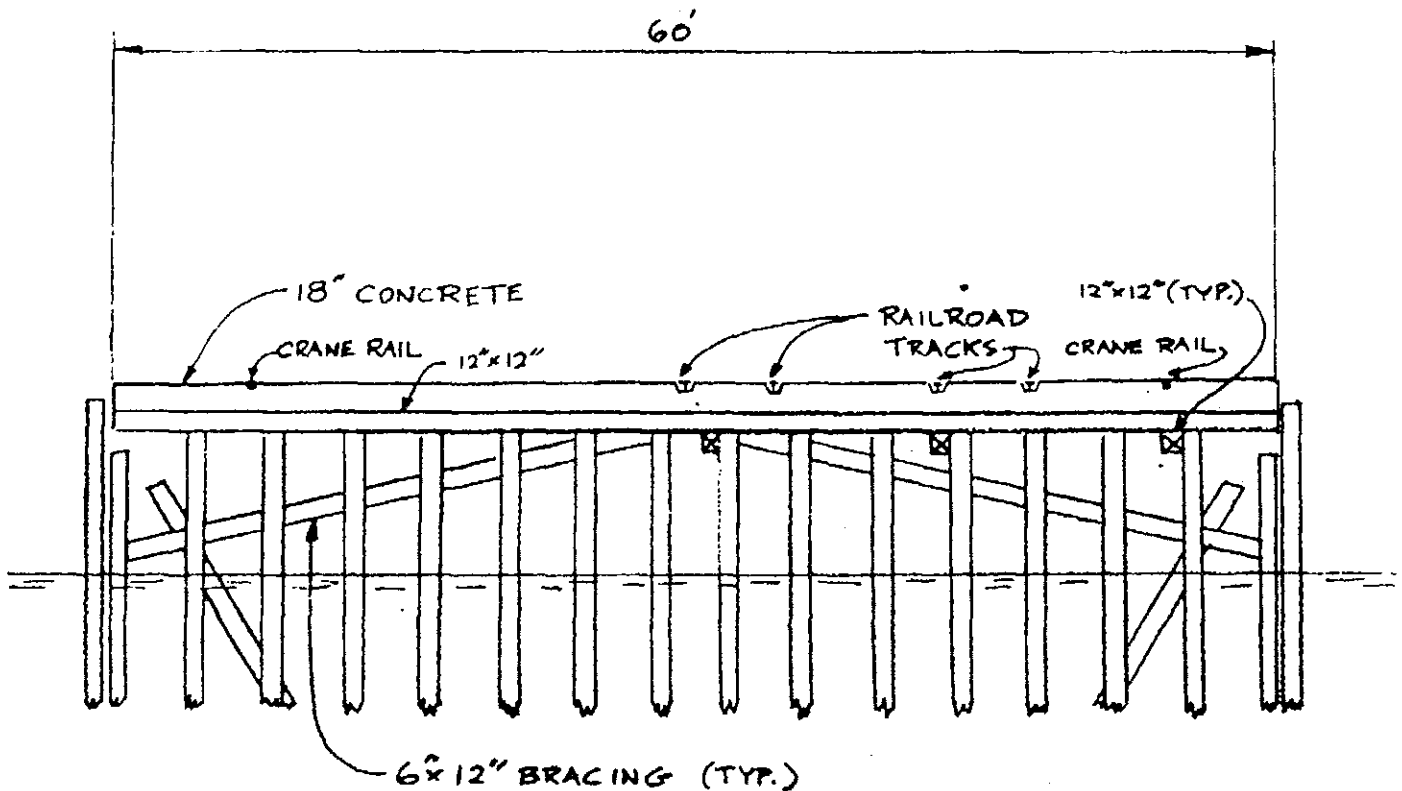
TYPICAL CROSS-SECTION OF BROOKLYN ARMY BASE PIER 1, TO NORTHWEST
